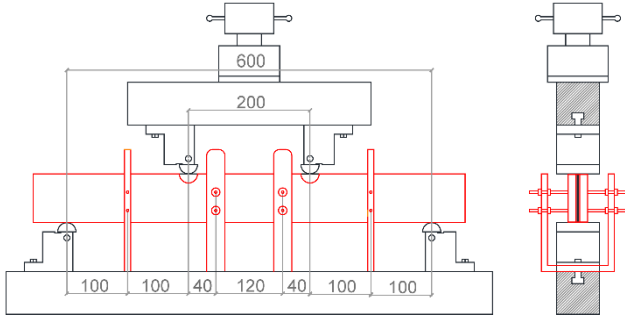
In-plane four-point bending final setup, front and side view, with focus on dimensions and lateral constraint (red)
